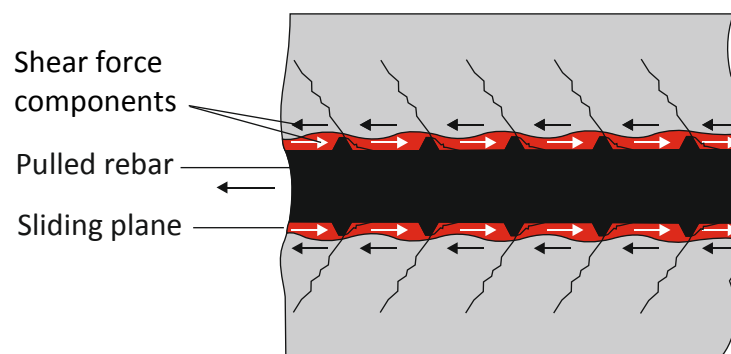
Cracks around the rebar for pull-out bond failure, after [29].
